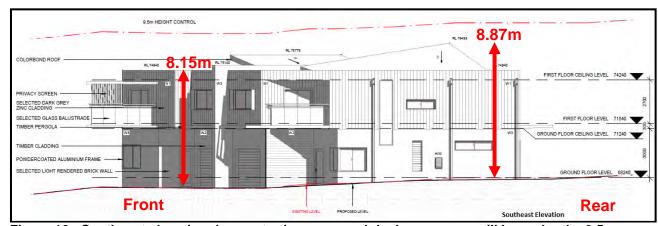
Southeast elevation demonstrating proposed dual occupancy will be under the 9.5m max building height (Source: ARC Homes)
